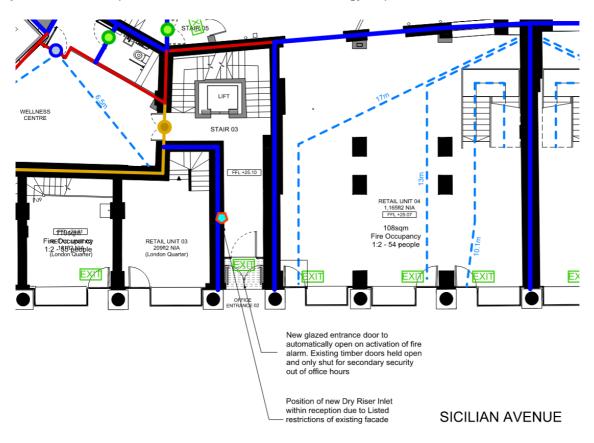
Stair 03 (+ Stair 04) Final Exit Arrangement
